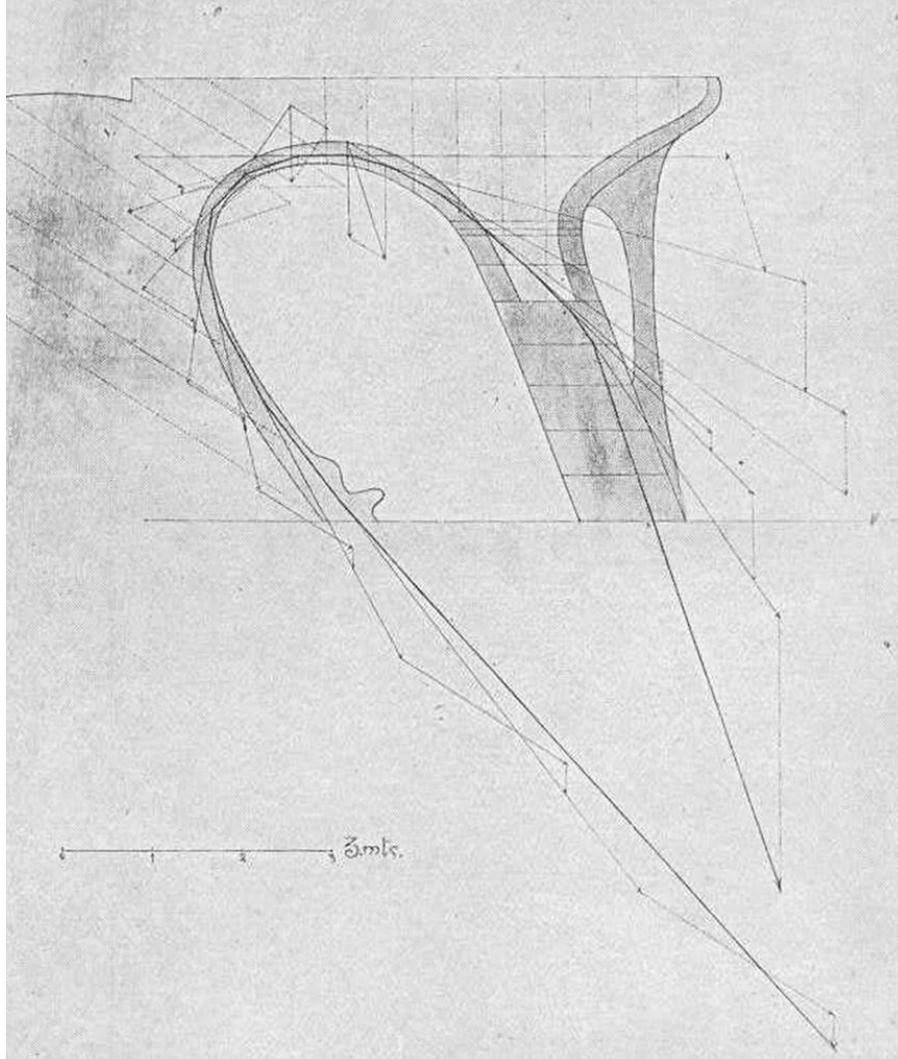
Gaudí's graphical design for the columns and retaining wall of the Park Güell (Rubió 1913).
